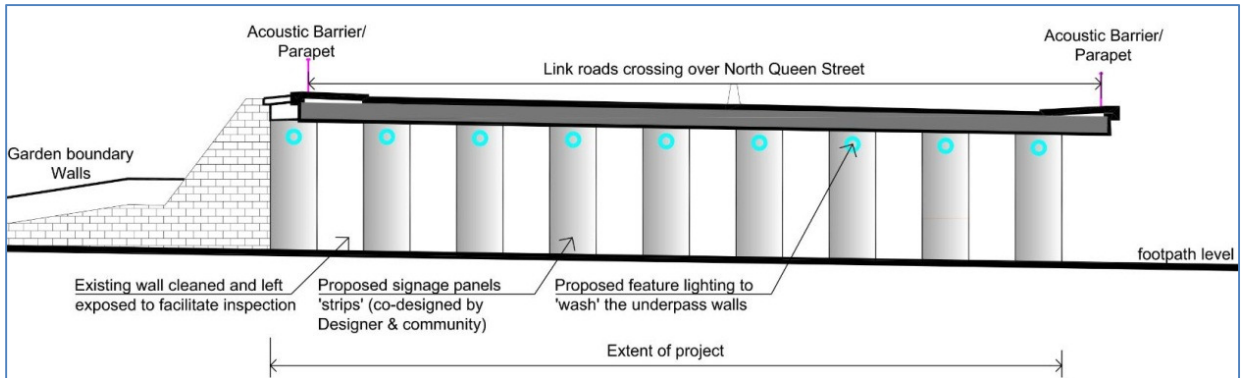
Proposed treatment to widened North Queen Street Bridge abutment
